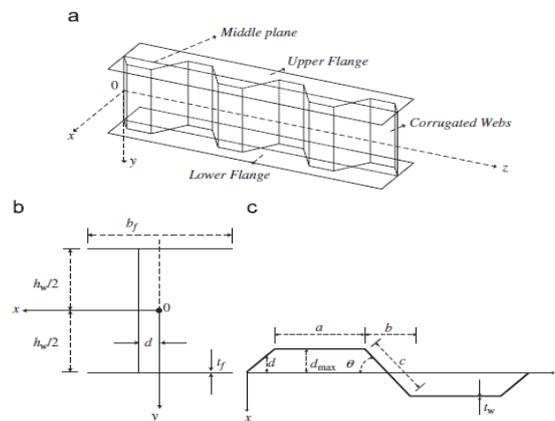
Profiles of I-girder with trapezoidal webs (Moon et. al, 2009)
